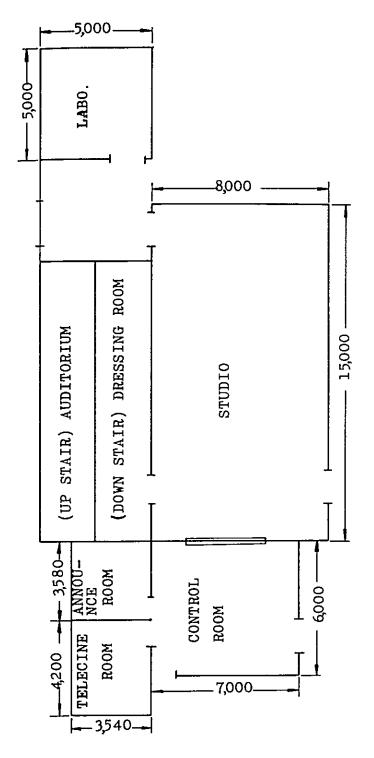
STUDIO LAYOUT OF LAMPANG STATION
